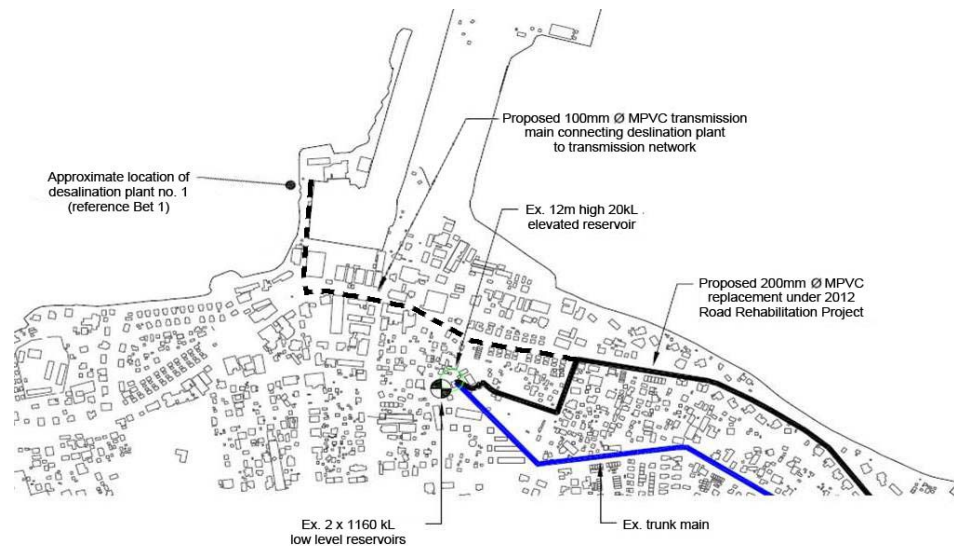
Location of Desalination Plant No. 1 (Betio 1)
